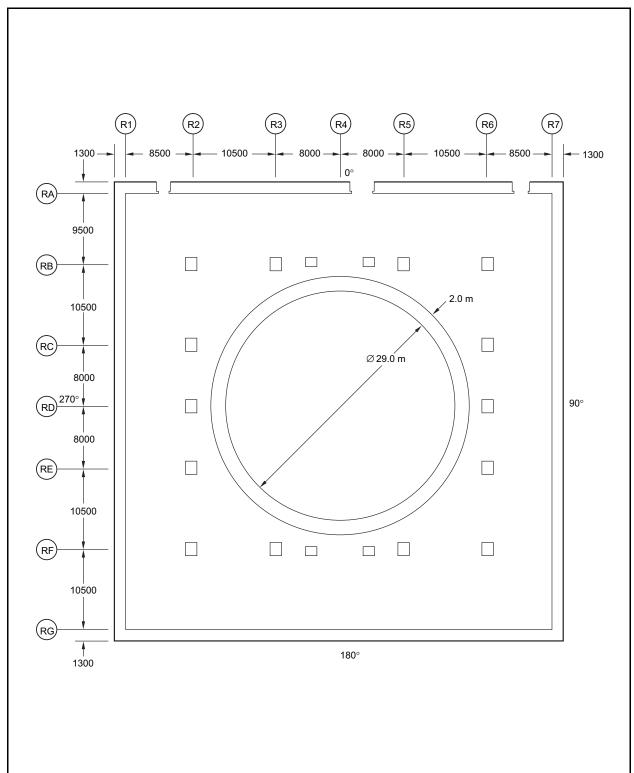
Reactor Building Arrangement Floor B1F Elevation 4800 mm
